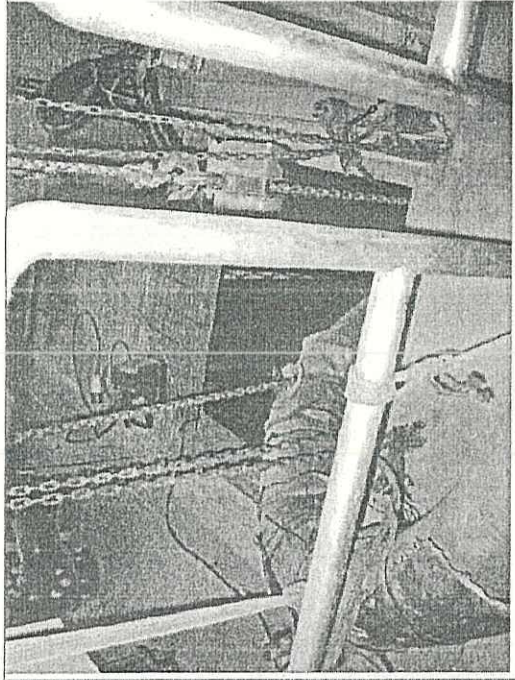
Sump pit inside Tai Lam Tunnel to collect tunnel seepage
